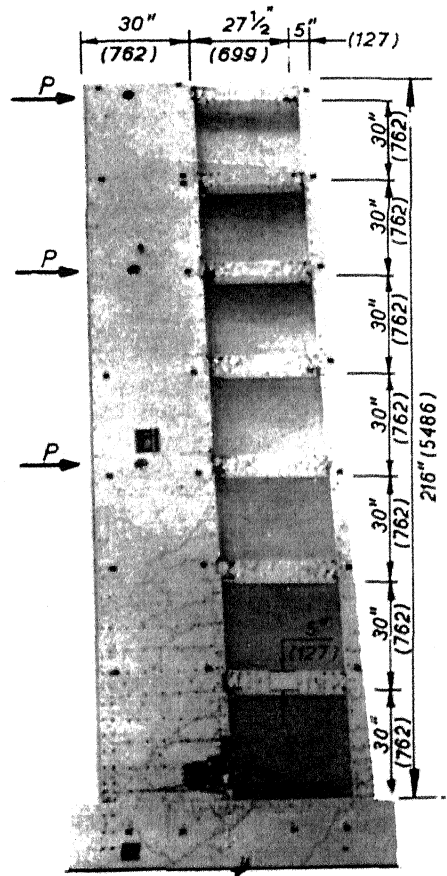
One Quarter Full Size Reinforced Concrete Frame-Shear Wall Assembly After Testing.
